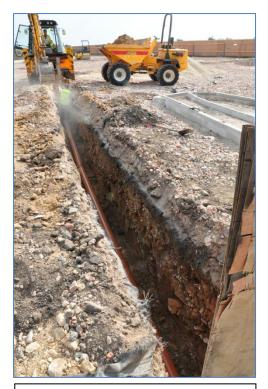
Excavation of a second service trench to the western side of the new build footprint, form the west
